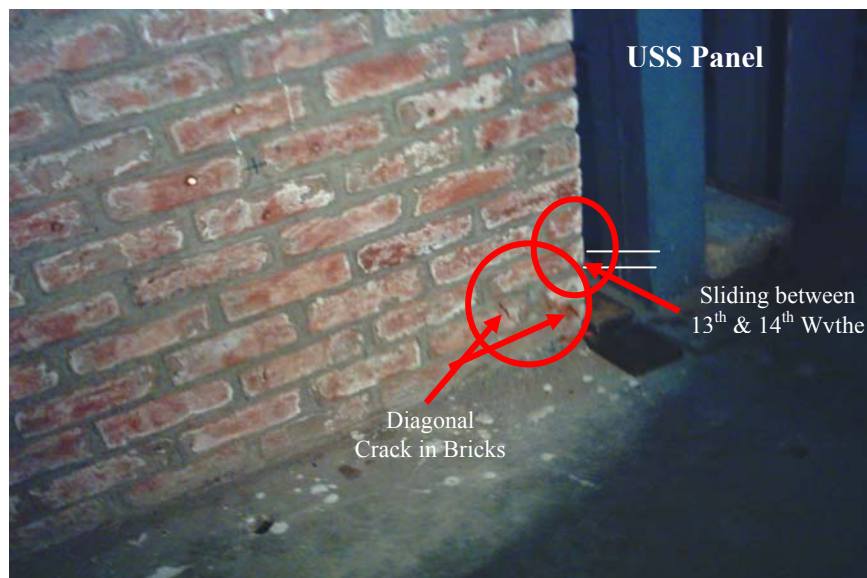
Sliding failure of un-strengthened masonry wall panel
